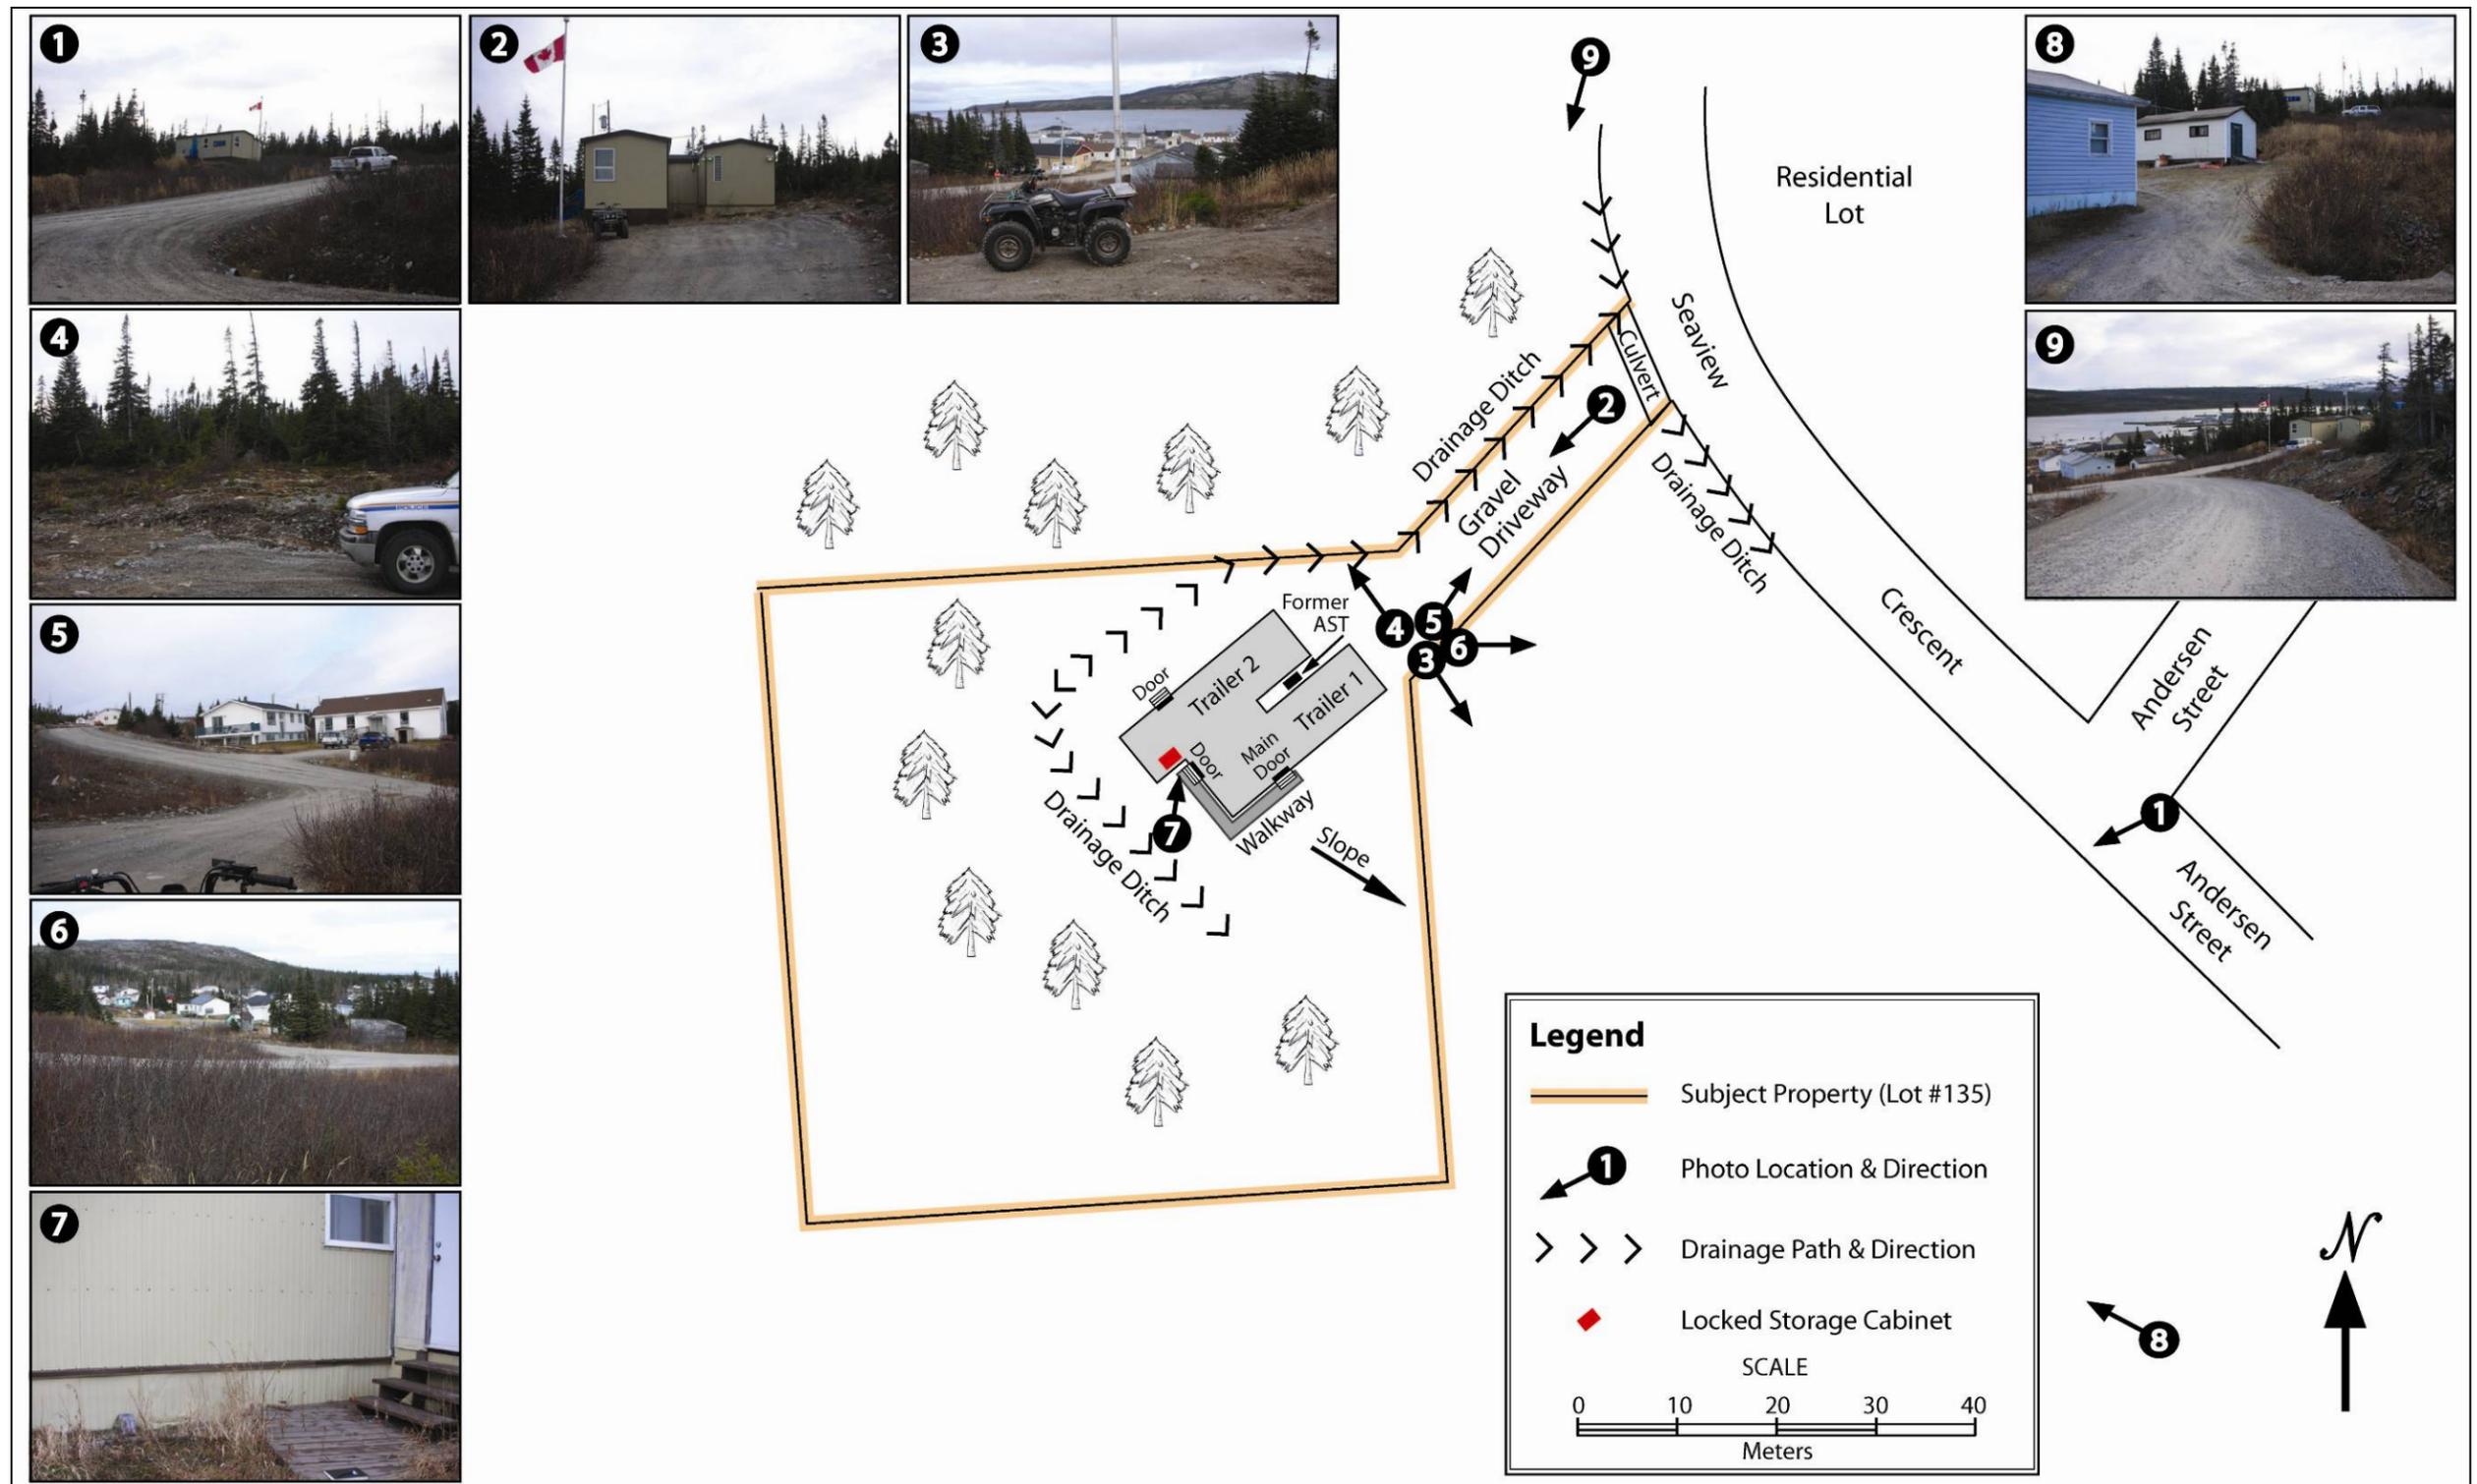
RCMP Detachment – 1 Seaview Cres. (Lot #135) Site Plan with Photographs
